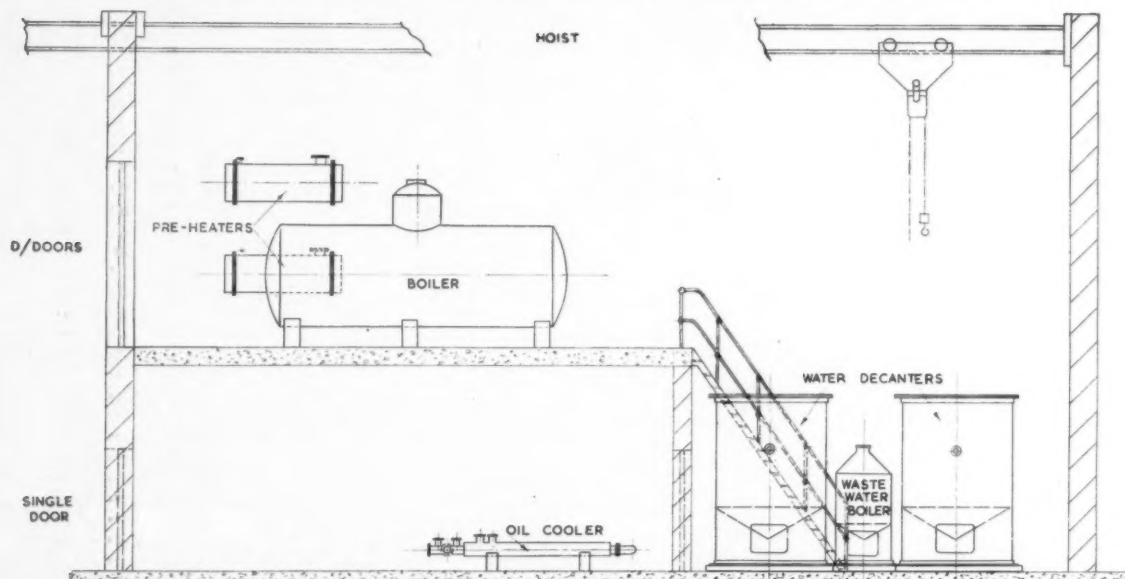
Plant layout drawing follows the preliminary layout shown in Fig. 1.
